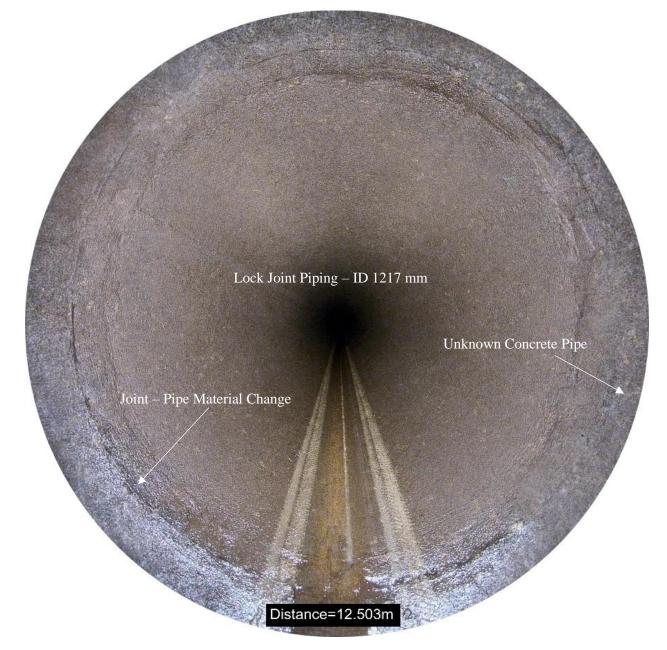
Transition area from Unknown Concrete Pipe to Lock Joint Pipe
